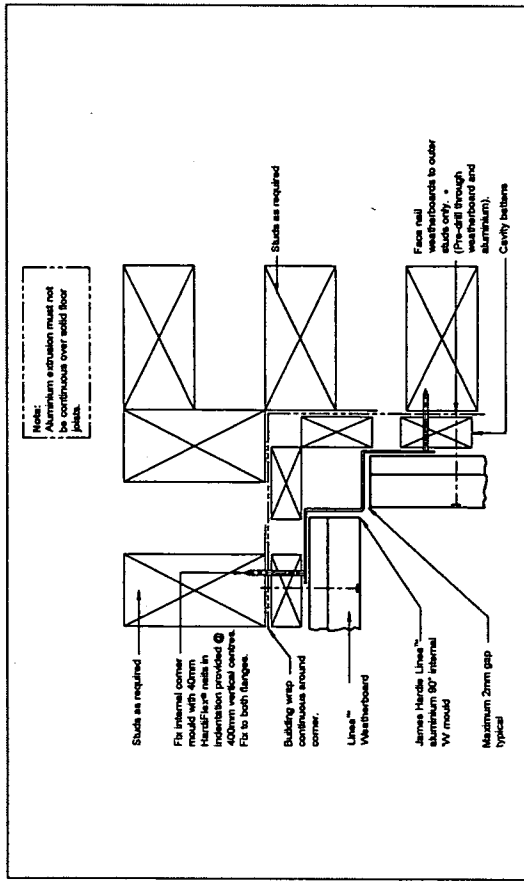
CAVITY INTERNAL 90° ALUMINIUM 'W' MOULD CORNER
